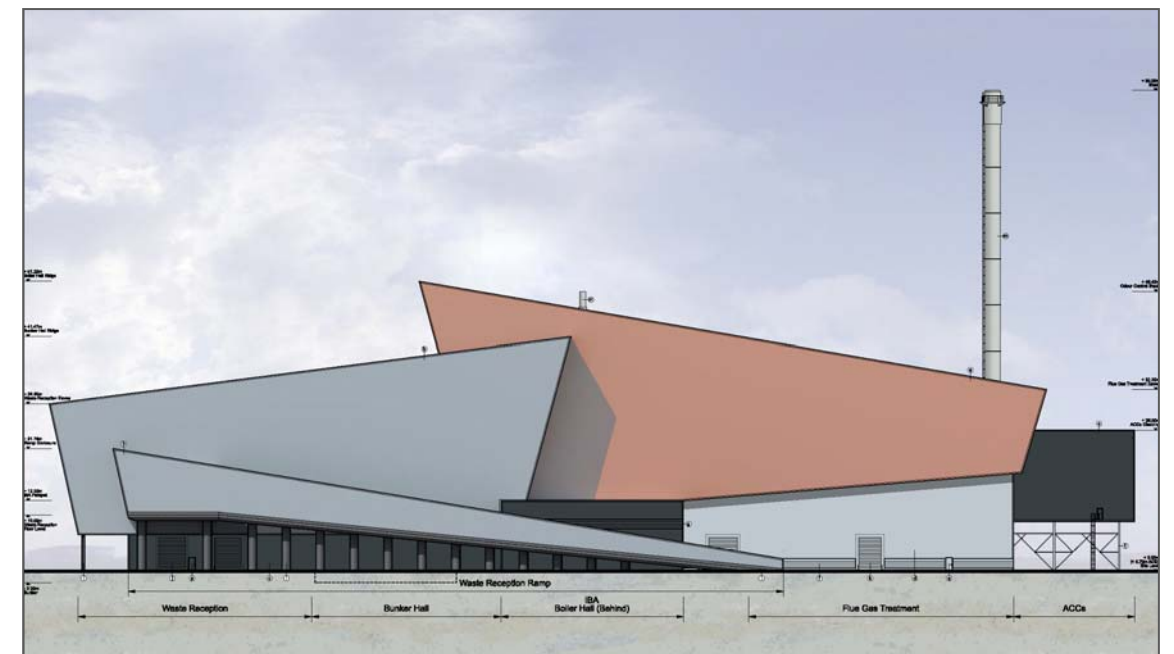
Proposed ERF west elevation – extract from drawing PL303
